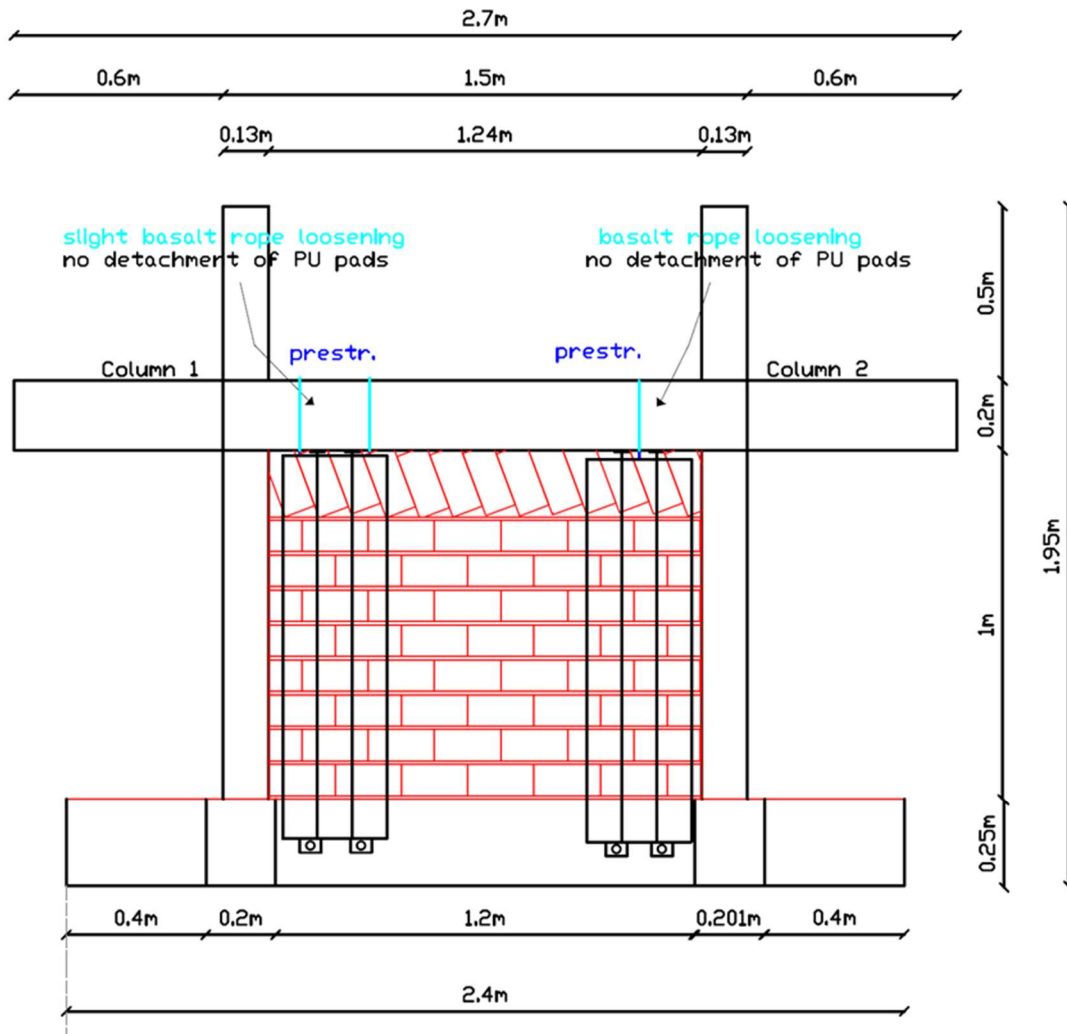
Observed damage after 1.4g test: Living walls LW1-2L showed slight basalt rope loosening allowing micromovements for high direct horizontal loads (severe wind), but no living wall collapse was observed. Living wall LW1-2R showed basalt rope loosening allowing micromovements for medium direct horizontal loads (intense wind), but no living wall collapse was observed.
